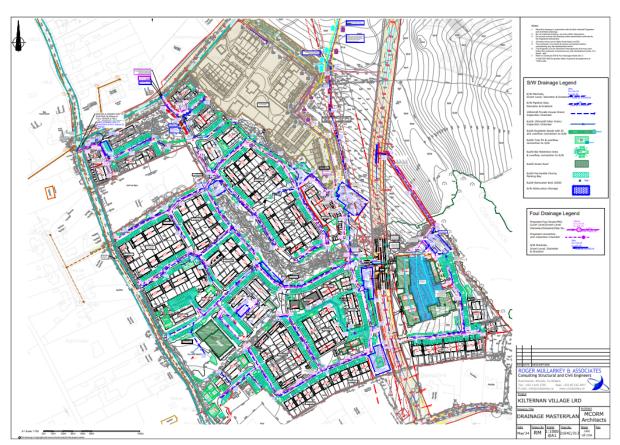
Drainage Masterplan (Roger Mullarkey & Associates, 2024. 2104C/313 Drainage Masterplan)
